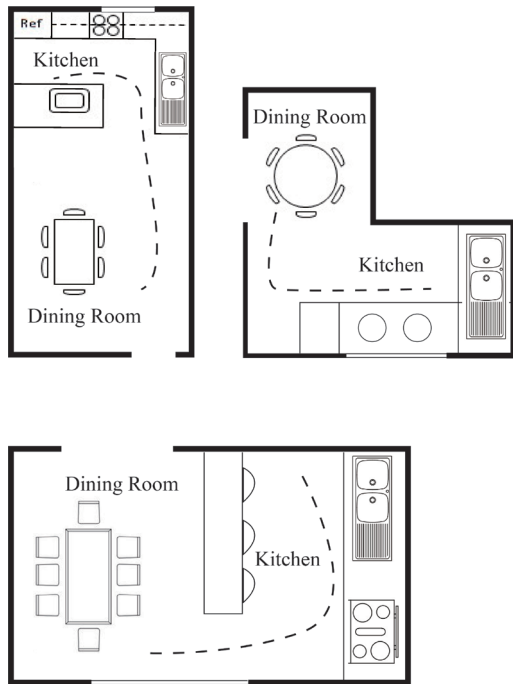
KITCHEN AND DINING ROOM PLANS
